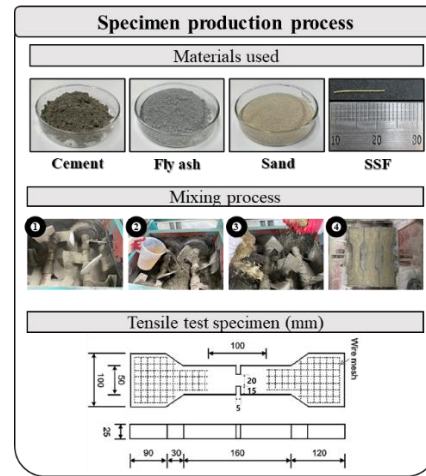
Details of the direct tensile test specimen manufacturing process and specimen
